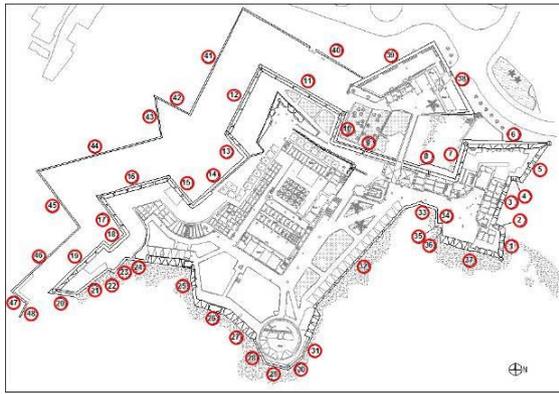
Notation of the sections of wall of the Fort and Buildings in its interior.
